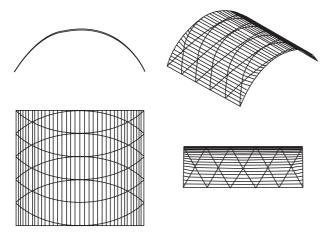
Front and side elevation, perspective view and plan of grid shell.
